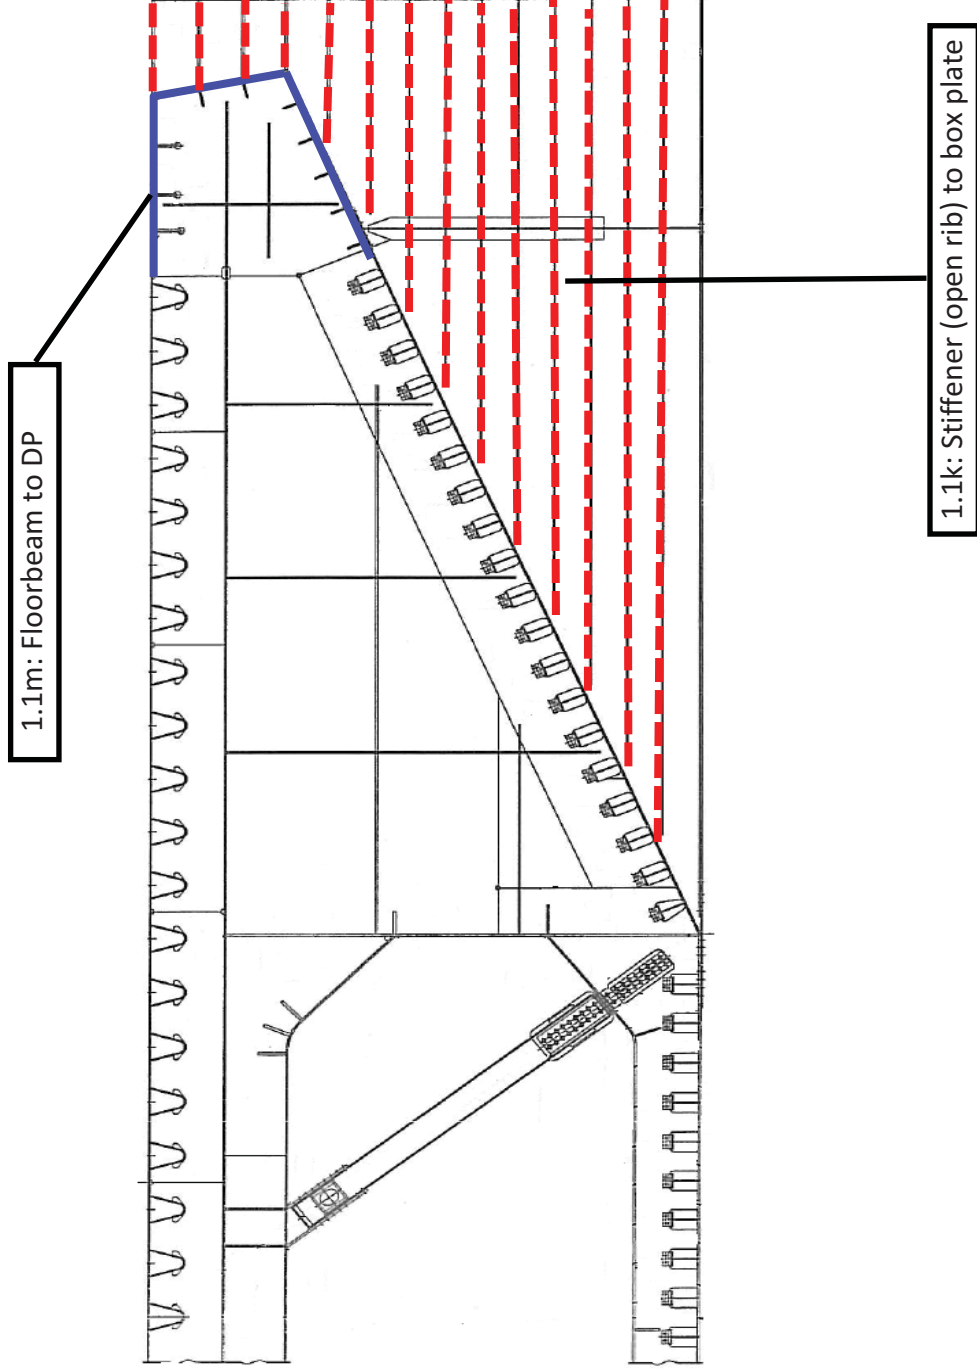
Lifts 1 - 12 Pure FCAW Welds Made with Old Welding Process and Contract Required NDT Less Than 100%
